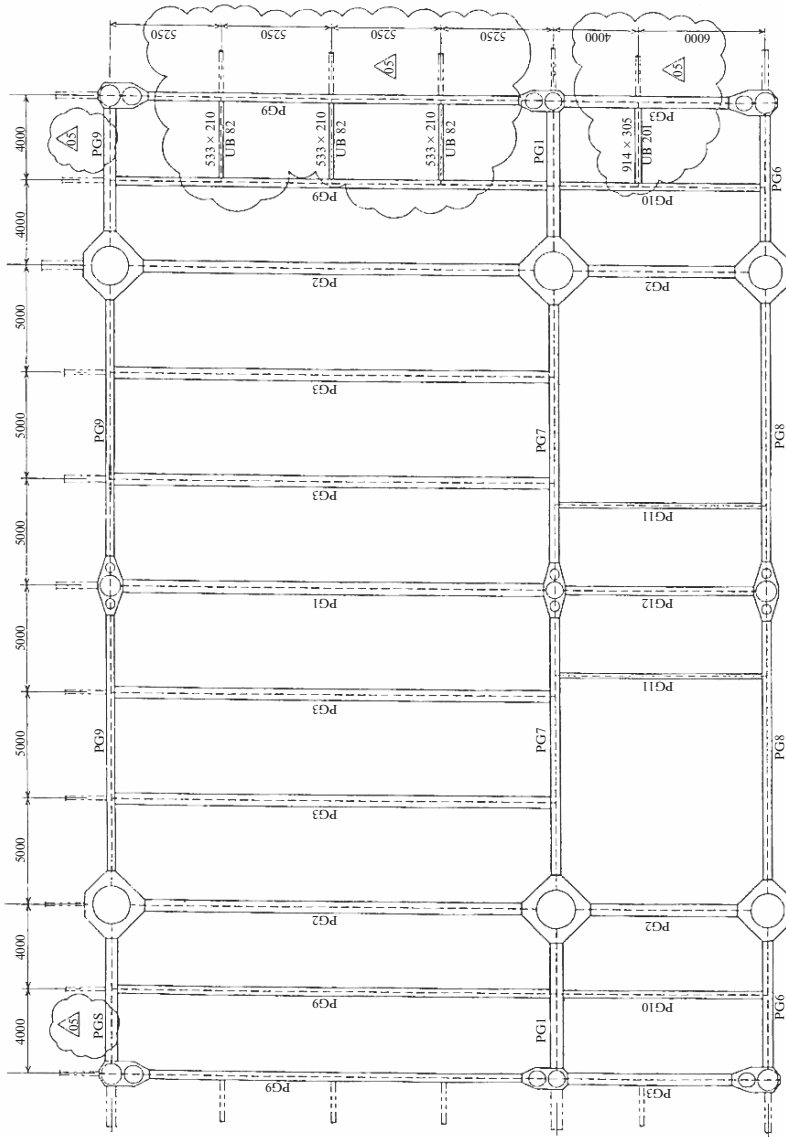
Deck framing plan (courtesy of AGIP UK)
